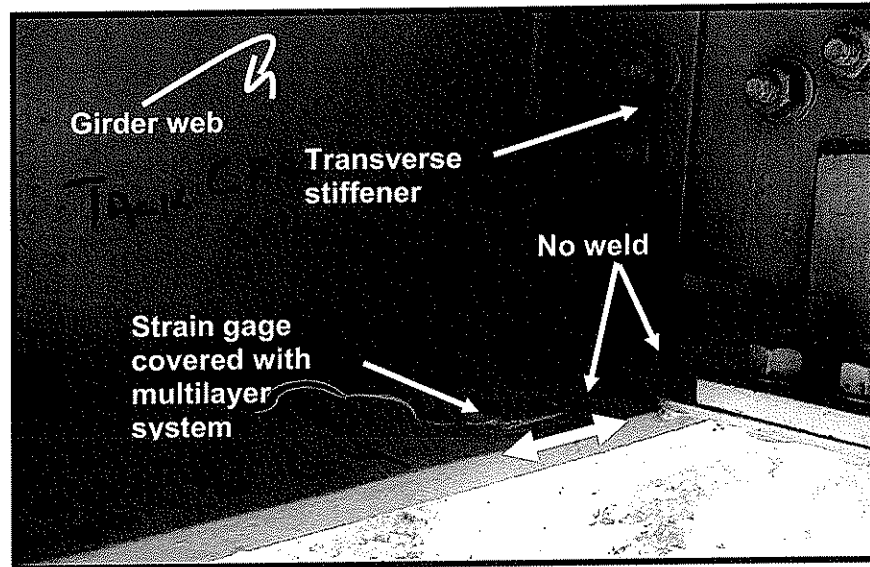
CH_1 installed on the top face of the bottom flange of girder G4 in span 1 at P.P. 3
